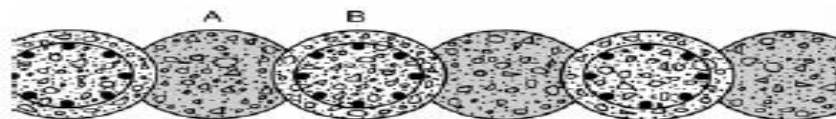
Secant pile wall scheme (venkata et al., 2011)
